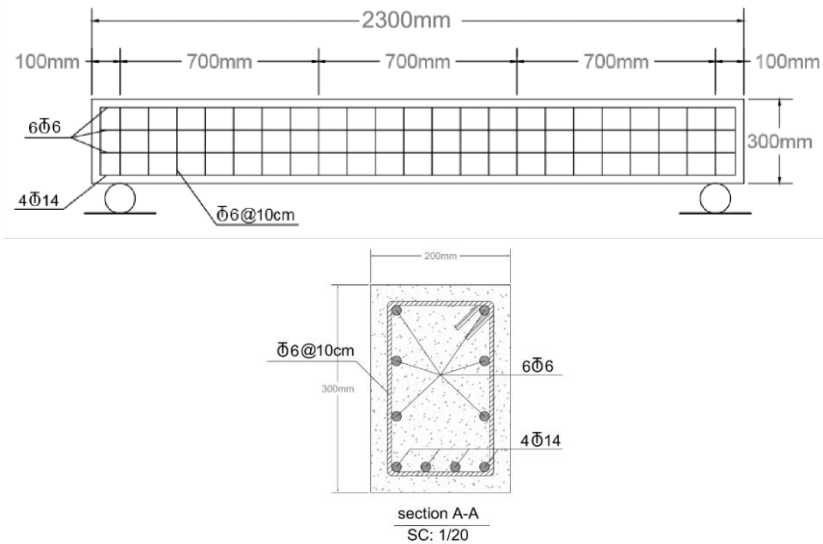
The cross section and reinforcement arrangements of tested specimens
